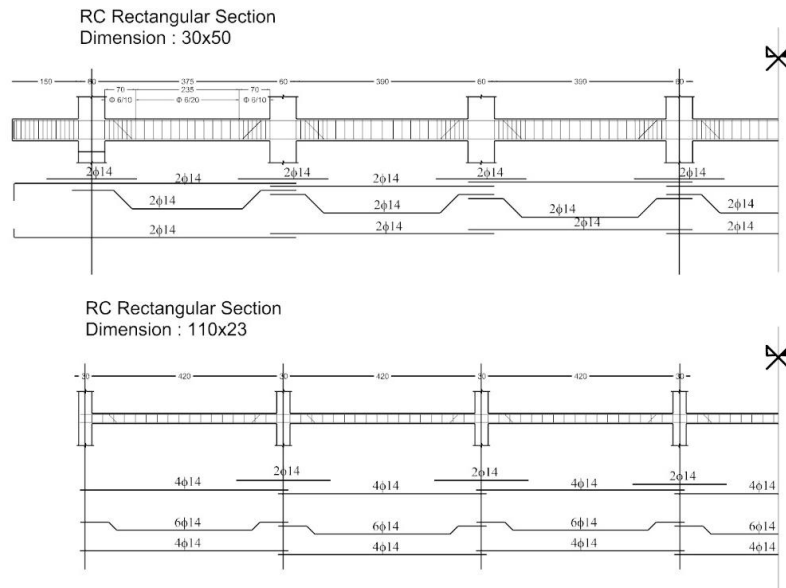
Example of the typical steel reinforcement distributions in the beams.
